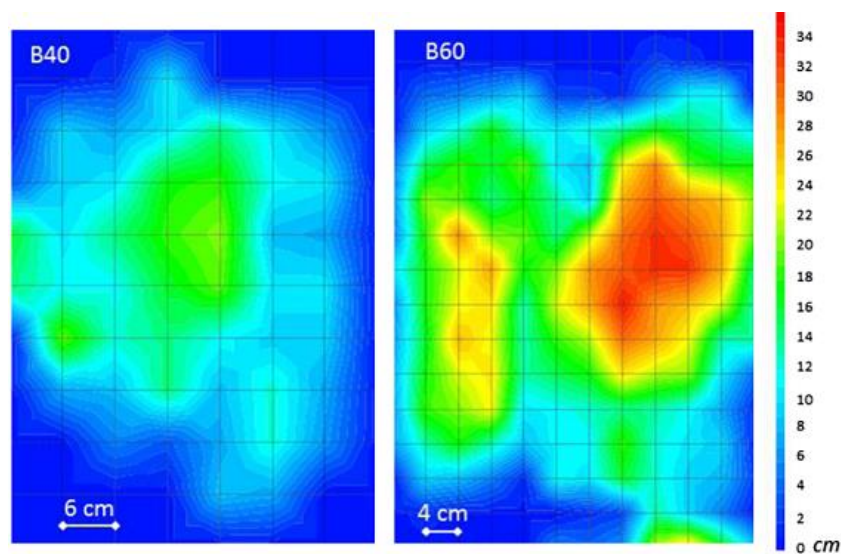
Surface mapping of spalling after one hour of ISO fire test. B40 slab on the left, B60 slab on the right (Mindeguia et al., 2013).
